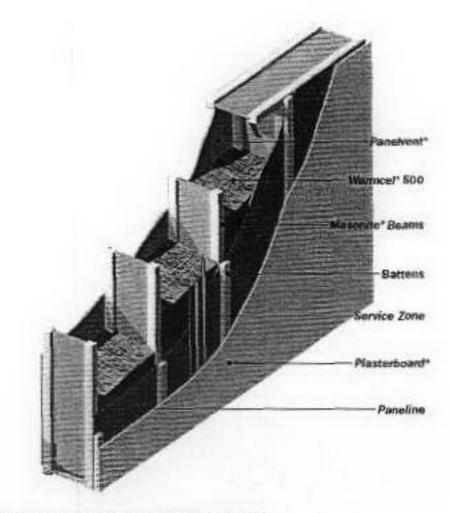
Cross section through a typical TRADIS EVT wall panel.
